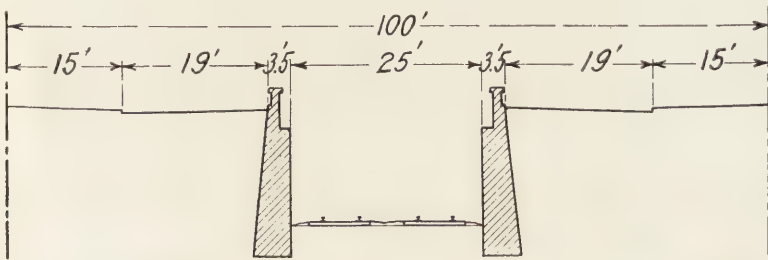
Showing open cut for rapid-transit railroad with retaining walls in street 100 ft. wide, constructed with a view to converting it into a tunnel, when necessary.
